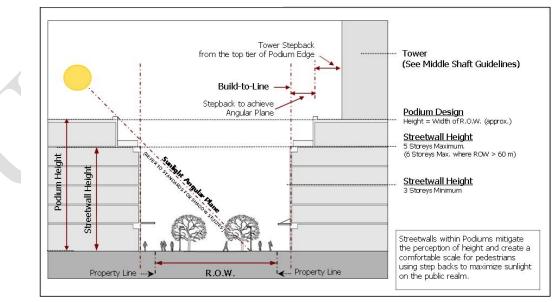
Podiums and their streetswalls will be designed with stepbacks at the upper storeys to provide light filled sidewalks and boulevards in the Downtown Core.
